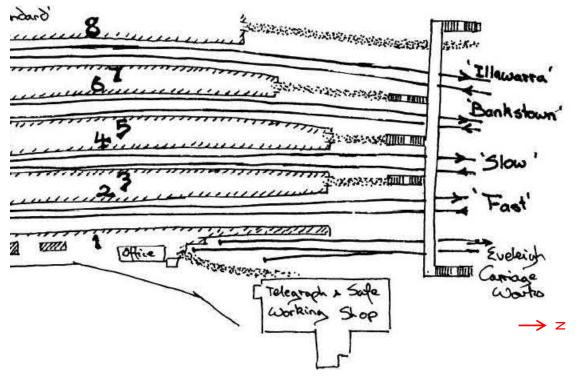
Station layout 1912-15 shows a building like Platform 1 Office named 'Office' and connection to Telegraph building (Telecommunications) and Eveleigh Railway Workshops (Source: (Paul Davies Pty Ltd, 2007)
